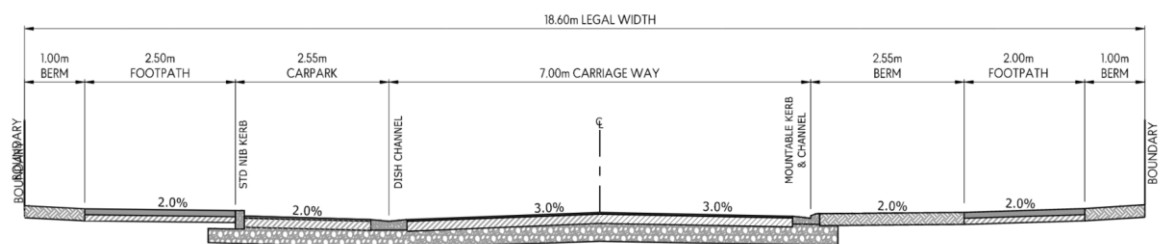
Typical Cross-Section (E) Collector - 18.6m with Berm & Carpark
